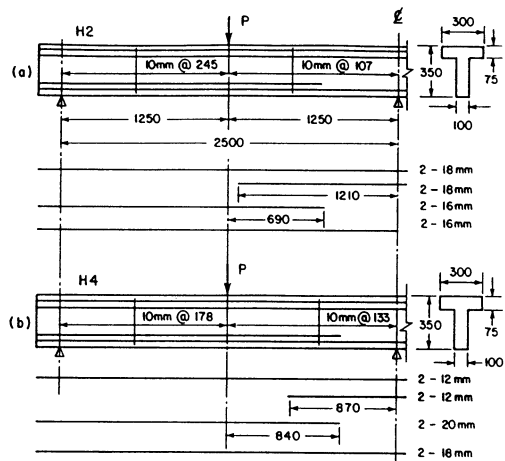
Geometry and reinforcement of Dilger's (1966) beams
